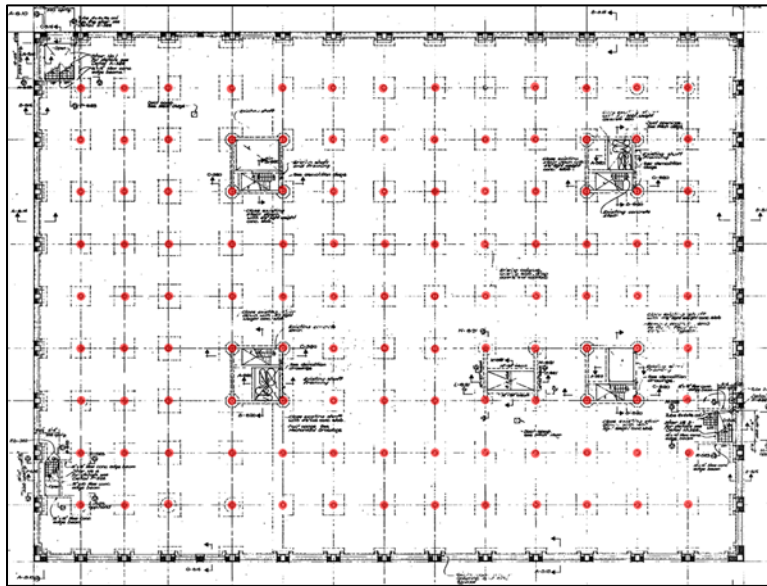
The original plan of one of the floors showing the interior concrete columns (red), and the exterior concrete columns (black dots) within the exterior concrete frame, and exterior brick walls. See Figure 7 for an elevation of the typical exterior wall with annotations of the added concrete framing on the interior surface of the brick infill. As constructed, the fourth bay from the left had a drive aisle the full width of the building. At the perimeter there are rectangular columns integrated into the concrete spandrels in the original construction, and the black dots represent the 1971 retrofit piers, see Figure 4.
